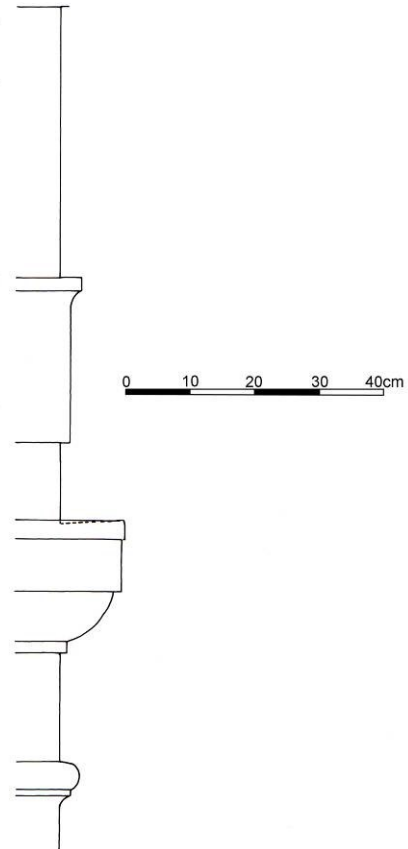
The orangery wall, the moulding at the top of pilaster 7.
